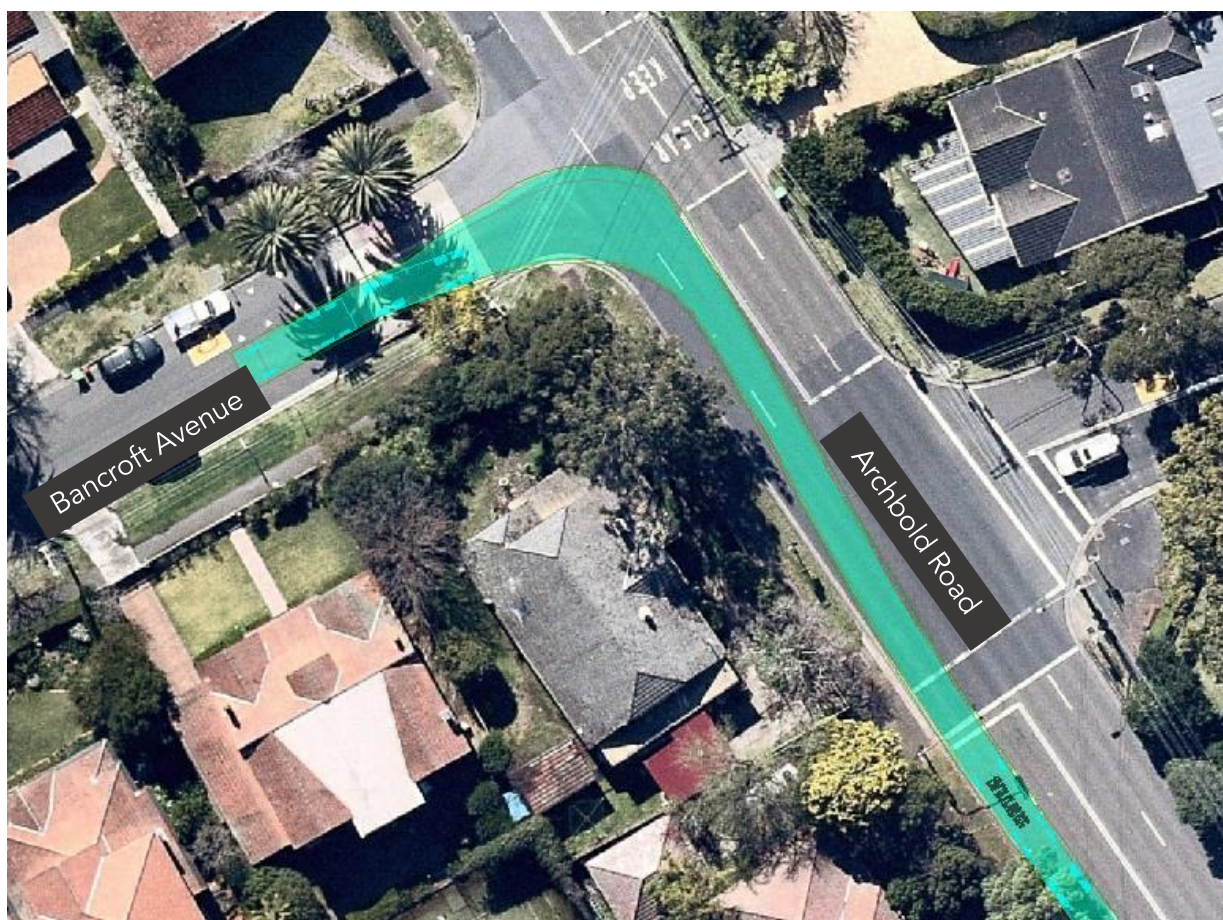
19m Truck and Dog at intersection 2 (Archbold Road/Bancroft Avenue)
